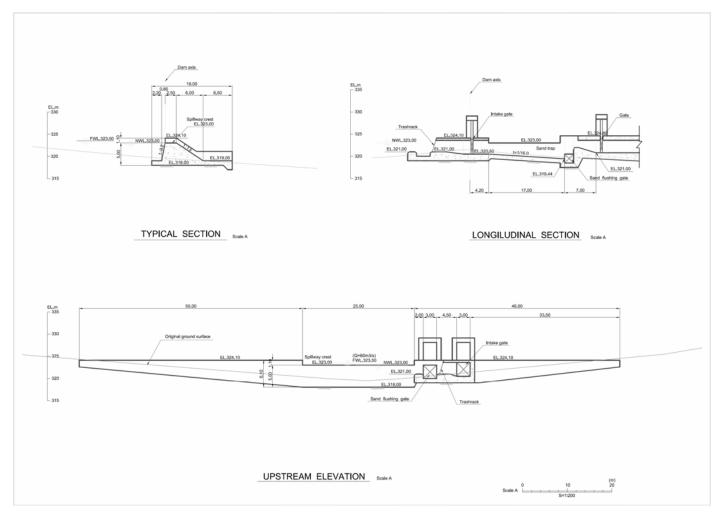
Elevation and Section of No.1 Intake Weir
